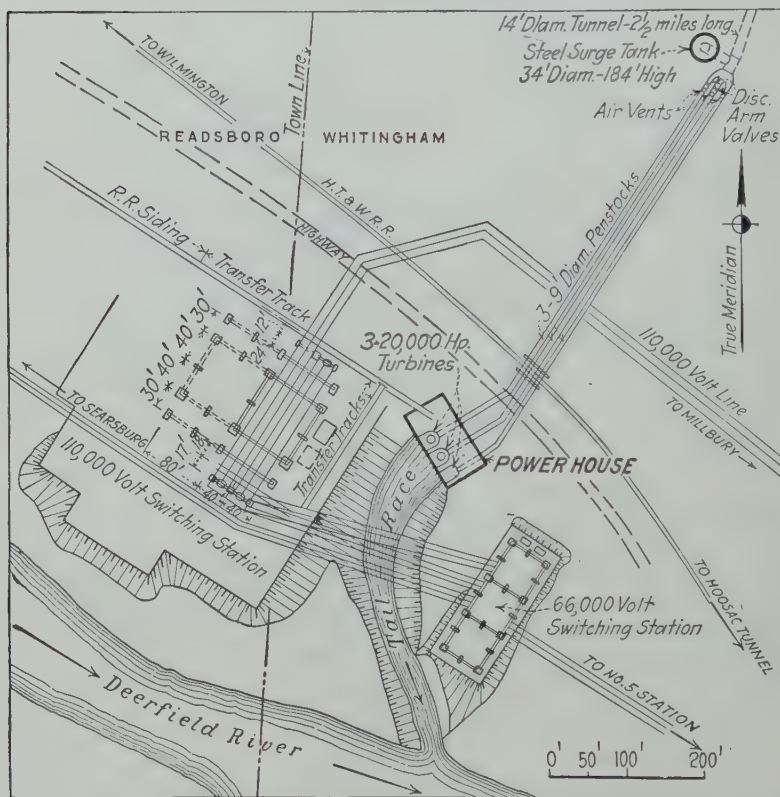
Davis Bridge plant, layout near power house—New England Power Company.
